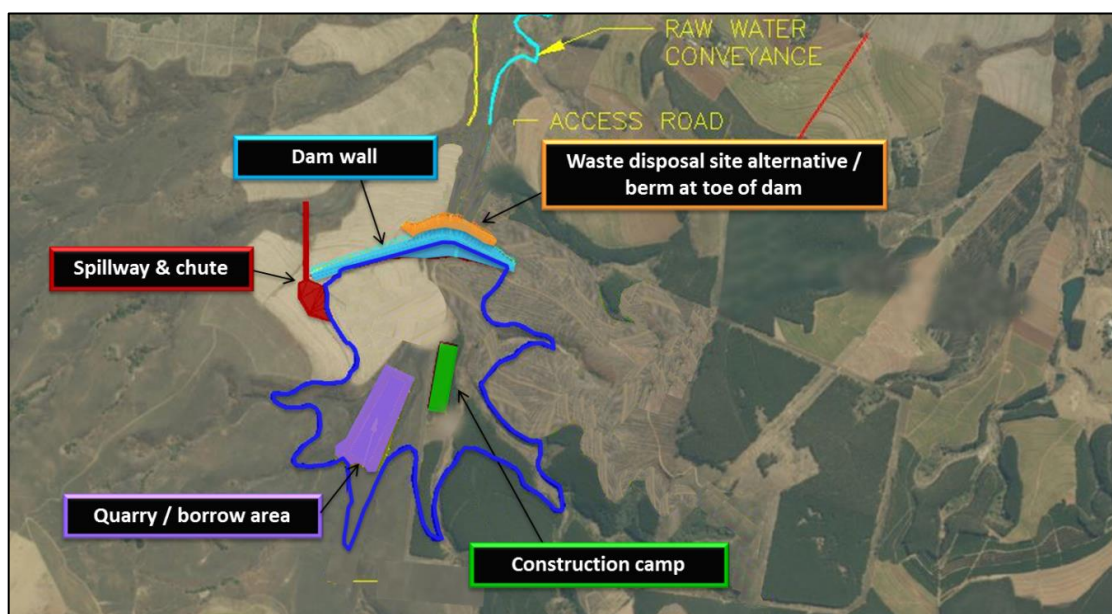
Layout of the proposed Langa Dam in the Mbangweni River
